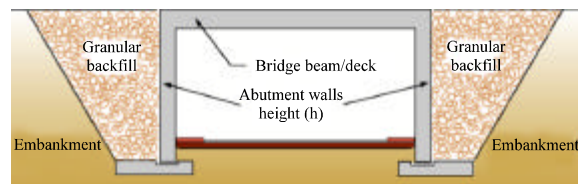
Frame abutment integral bridge (England and Tsang, 2001)
